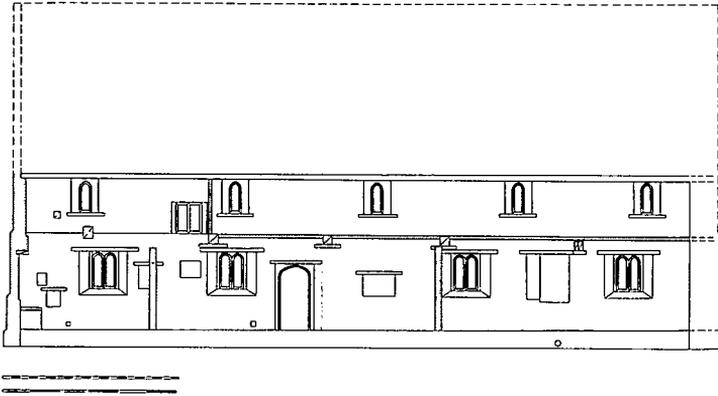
Eye, Abbey Farm Barn (EYE 093). Internal western elevation of the Tudor priory bakehouse, showing the original door and windows together with various secondary features. Scales in feet (top) and metres.
